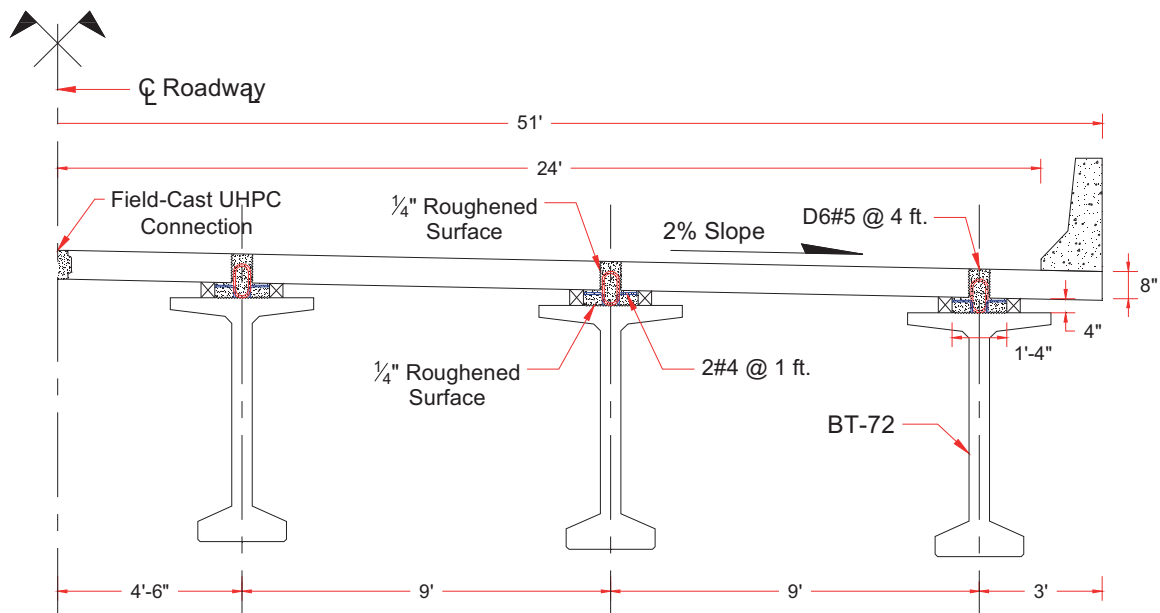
Designed PCI BDM Ex. 9.1a Bridge Cross-Section Using Proposed Connection
